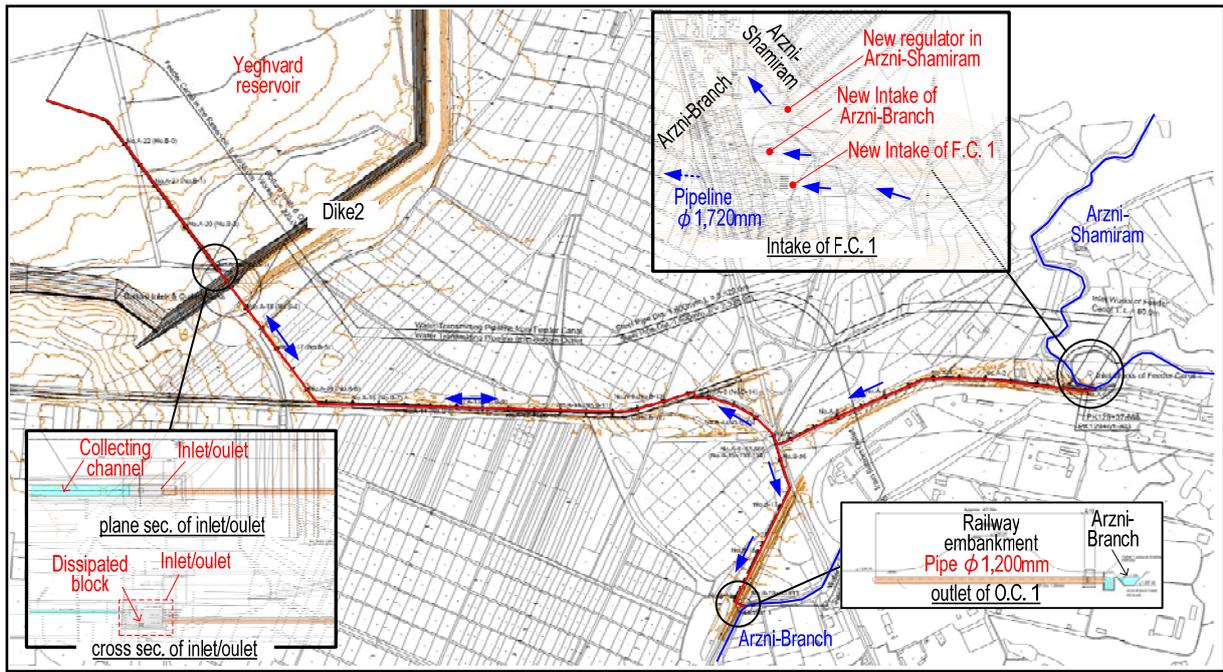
Plan of Feeder Canal 1 and Outlet Canal 1
